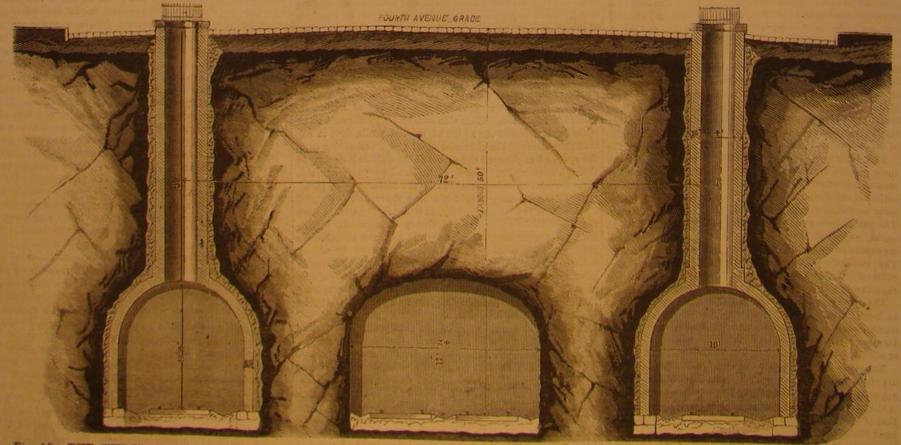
THE UNDERGROUND RAILWAY IN NEW YORK. THE ROCK TUNNELS FOURTH AVENUE, BETWEEN 92d AND 94th STREETS
